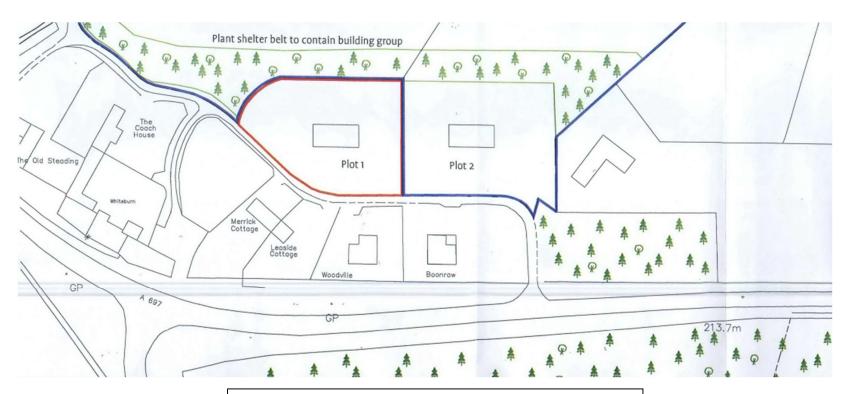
Proposed site plan refused under Application: 11/00156/PPP & 11/00157/PPP and Appeal: 11/00023/RREF & 11/00024/RREF.
